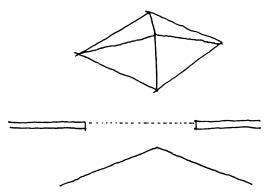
Skylight with a sloped reflectors below ceiling plane.
